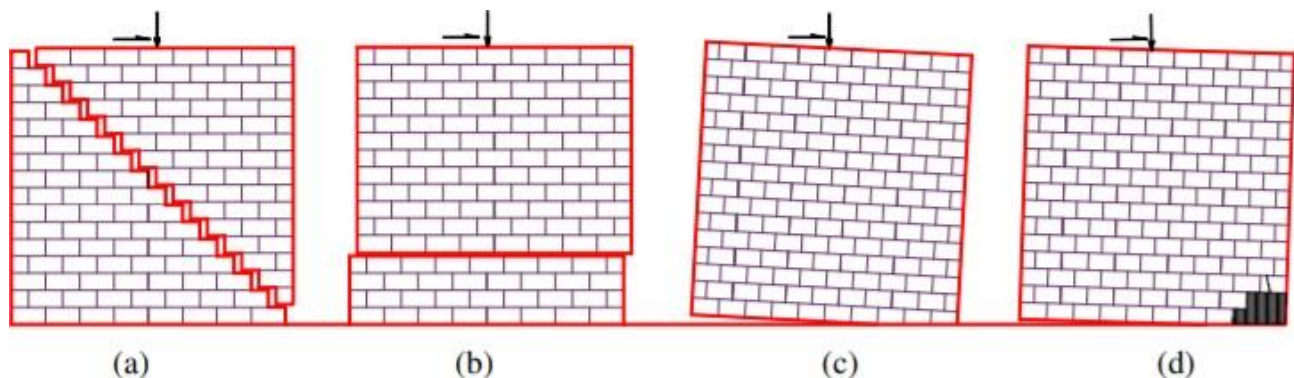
in-plane failure mechanisms of URM walls (a) shear failure; (b), sliding failure; (c) rocking failure and (d) toe crushing (El Gawady et al., 2006)
